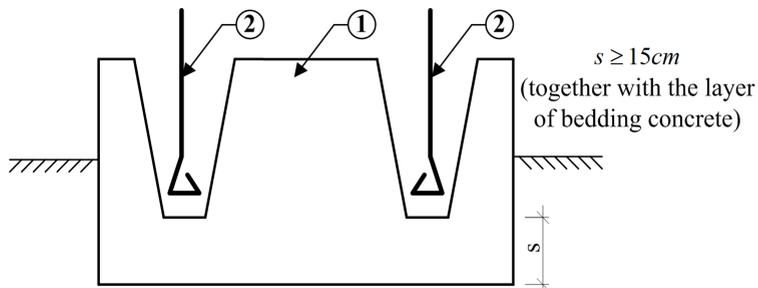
The condition relating to the protection of holes for anchor bolts; 1 – the foundation, 2 – the anchor bolt
